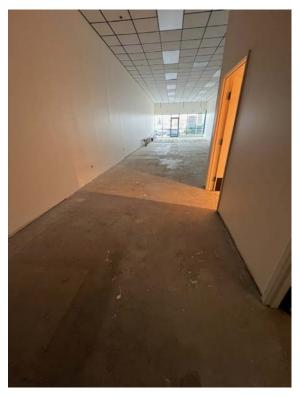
Floor Slab in Rear Utility Room of Former Harbour Pointe Cleaners (Suite B6) (November 14, 2024)
